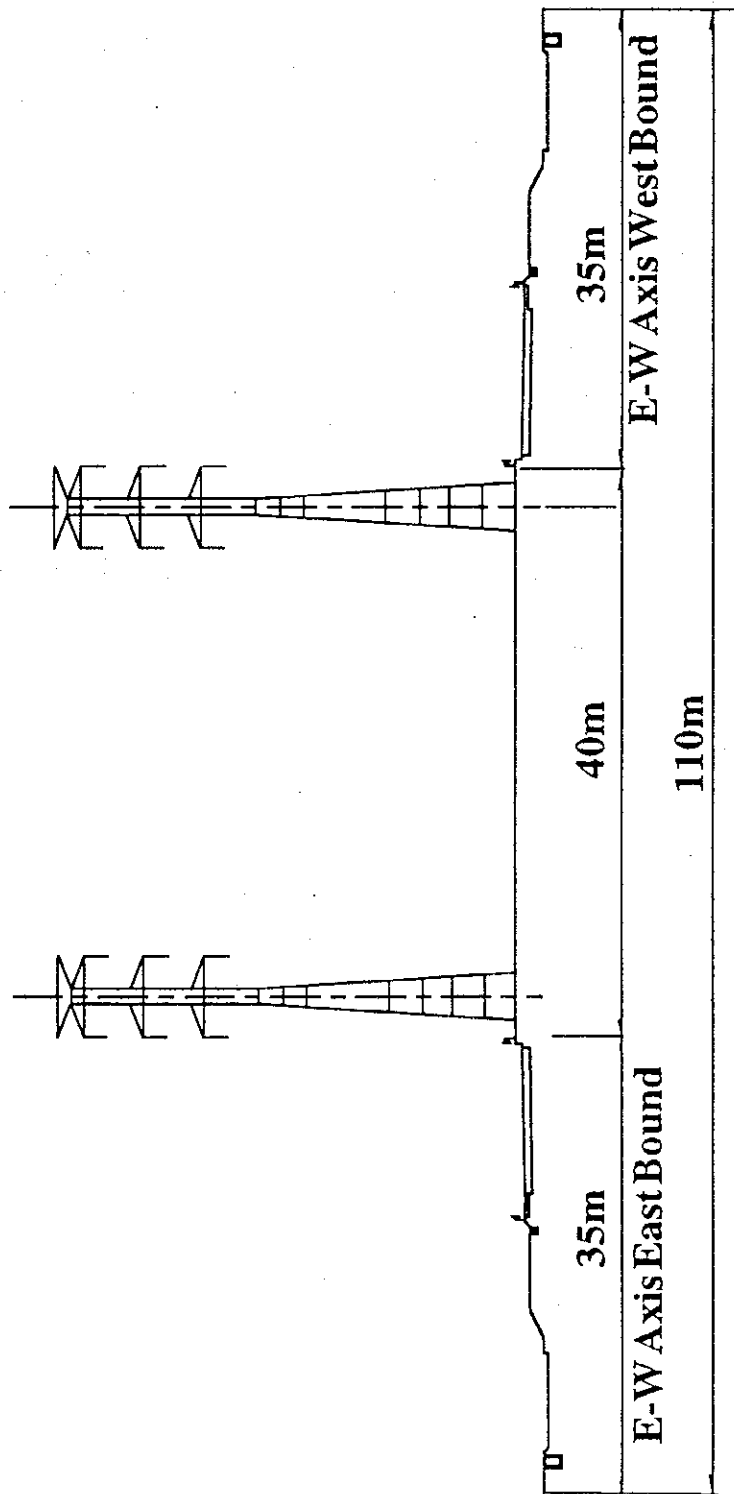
Typical Cross Section for the East - West Axis
